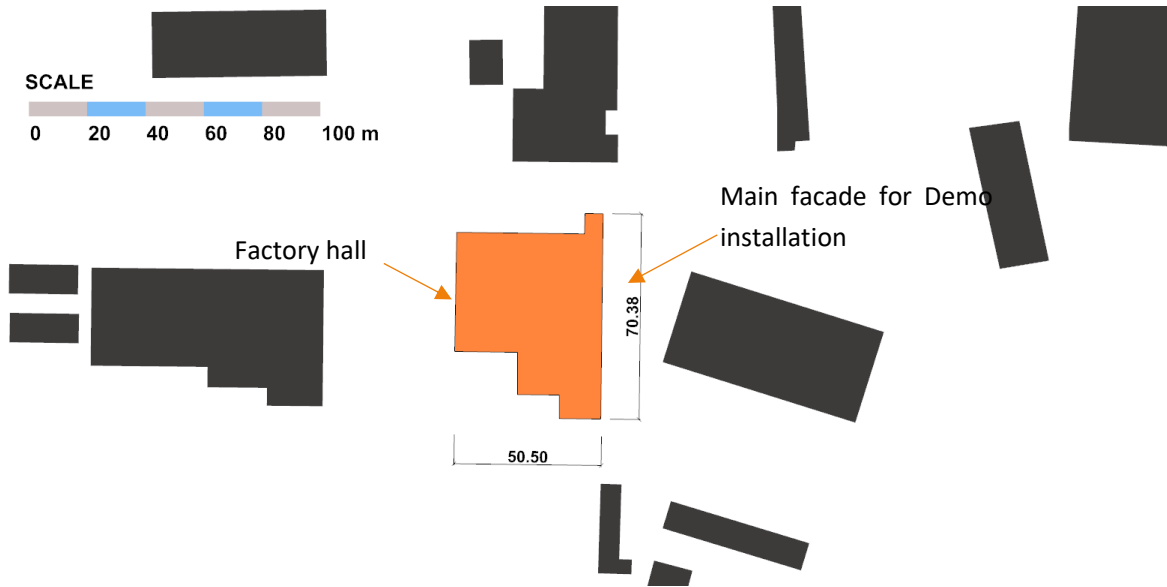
LOCAL SITUATION OF THE ALTERNATIVE 1 DEMO BUILDING
